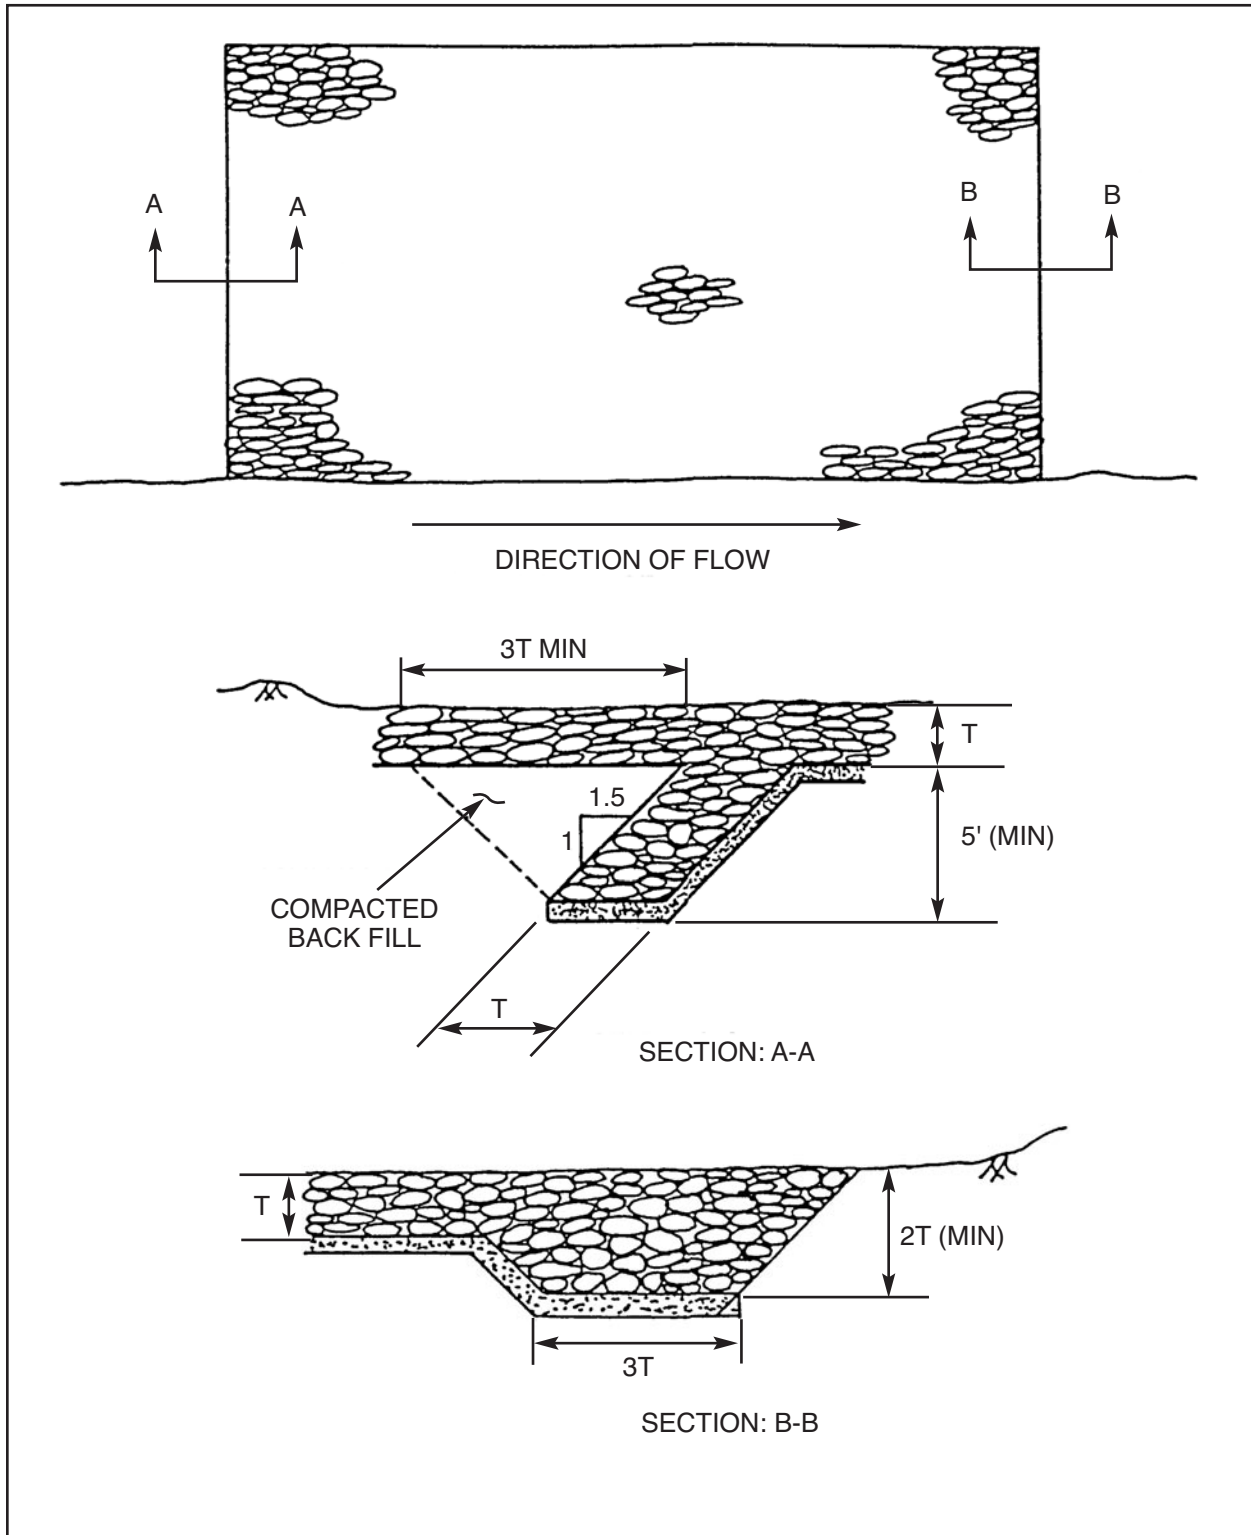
Typical Riprap Installation: Plan And Flank Details
